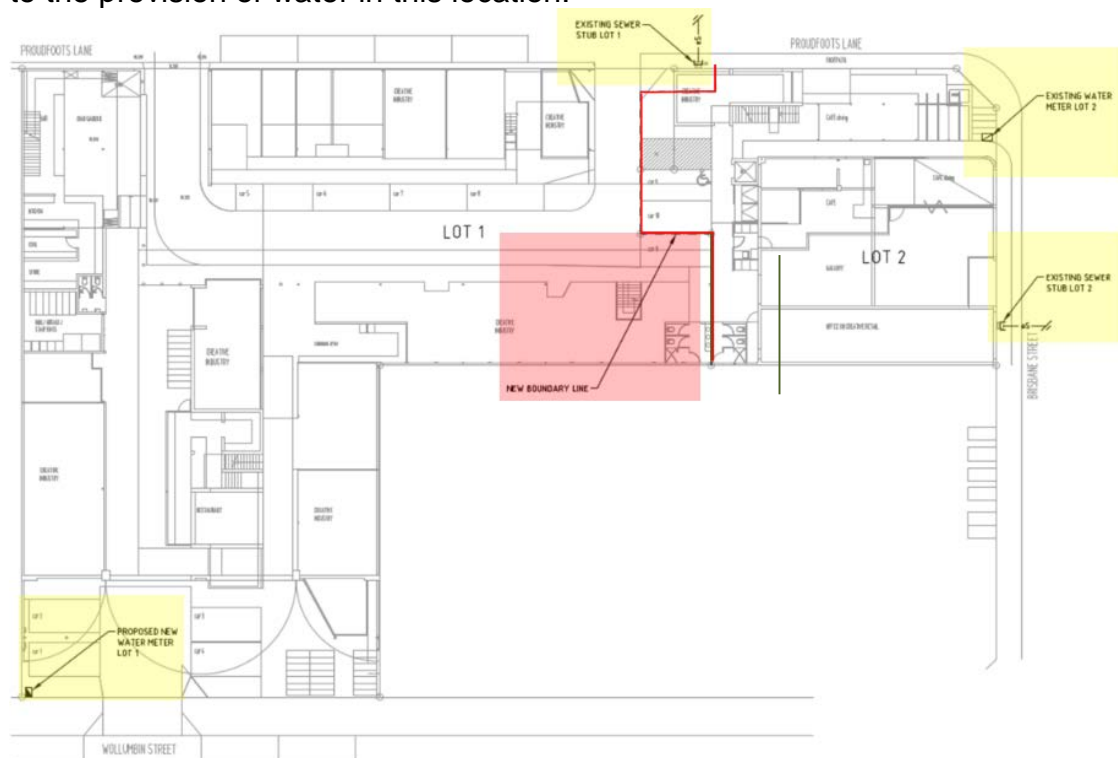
Preliminary Hydraulic (Drainage and Water) Plans (prepared by Sedgman Engineering dated 17 May 2018)
